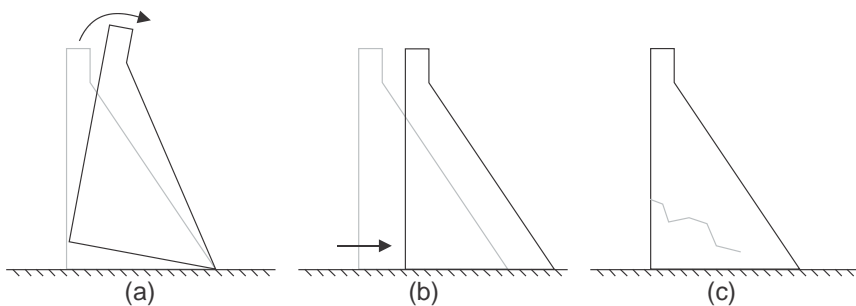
The failure mechanism: (a) Overturning about the toe. (b) Sliding in the dam-foundation interface. (c) Overstressing (cracking).
